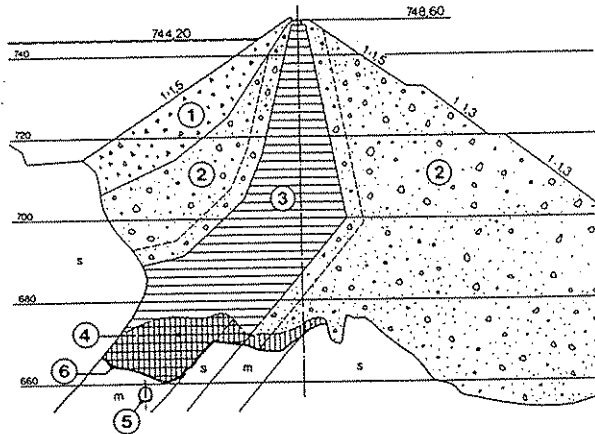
Bolgenach dam, typical section (elevations m a.s.l., adapted from Innerhofer & Loacker 1982).
